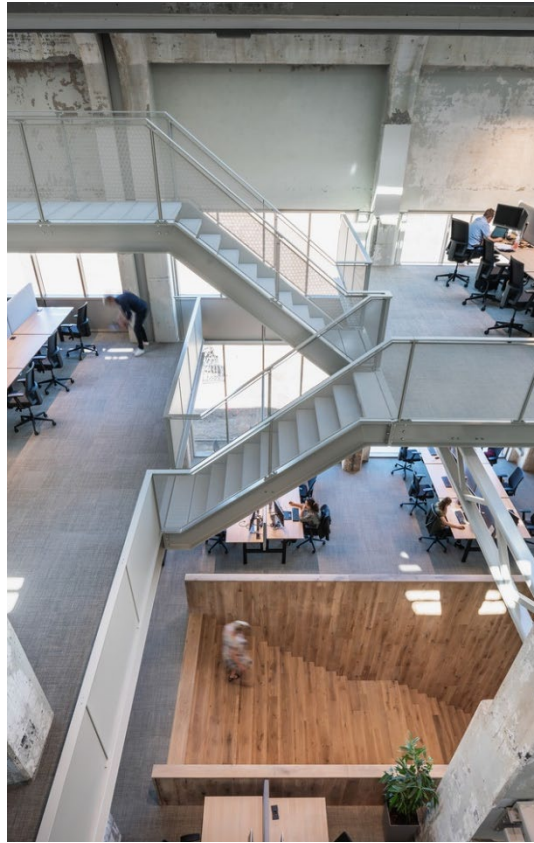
, Roon M. (2020)., New structural system integration, creates new conditions of the section & space plan, in Arnhem.
